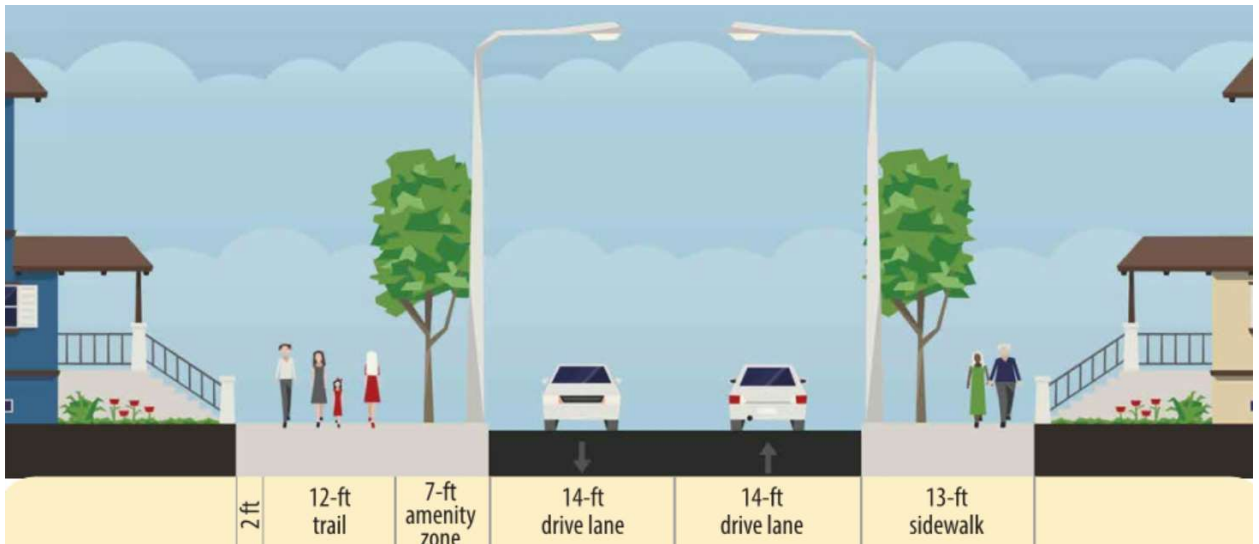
Two-Lane with Shared Use Side Path Typical Section
